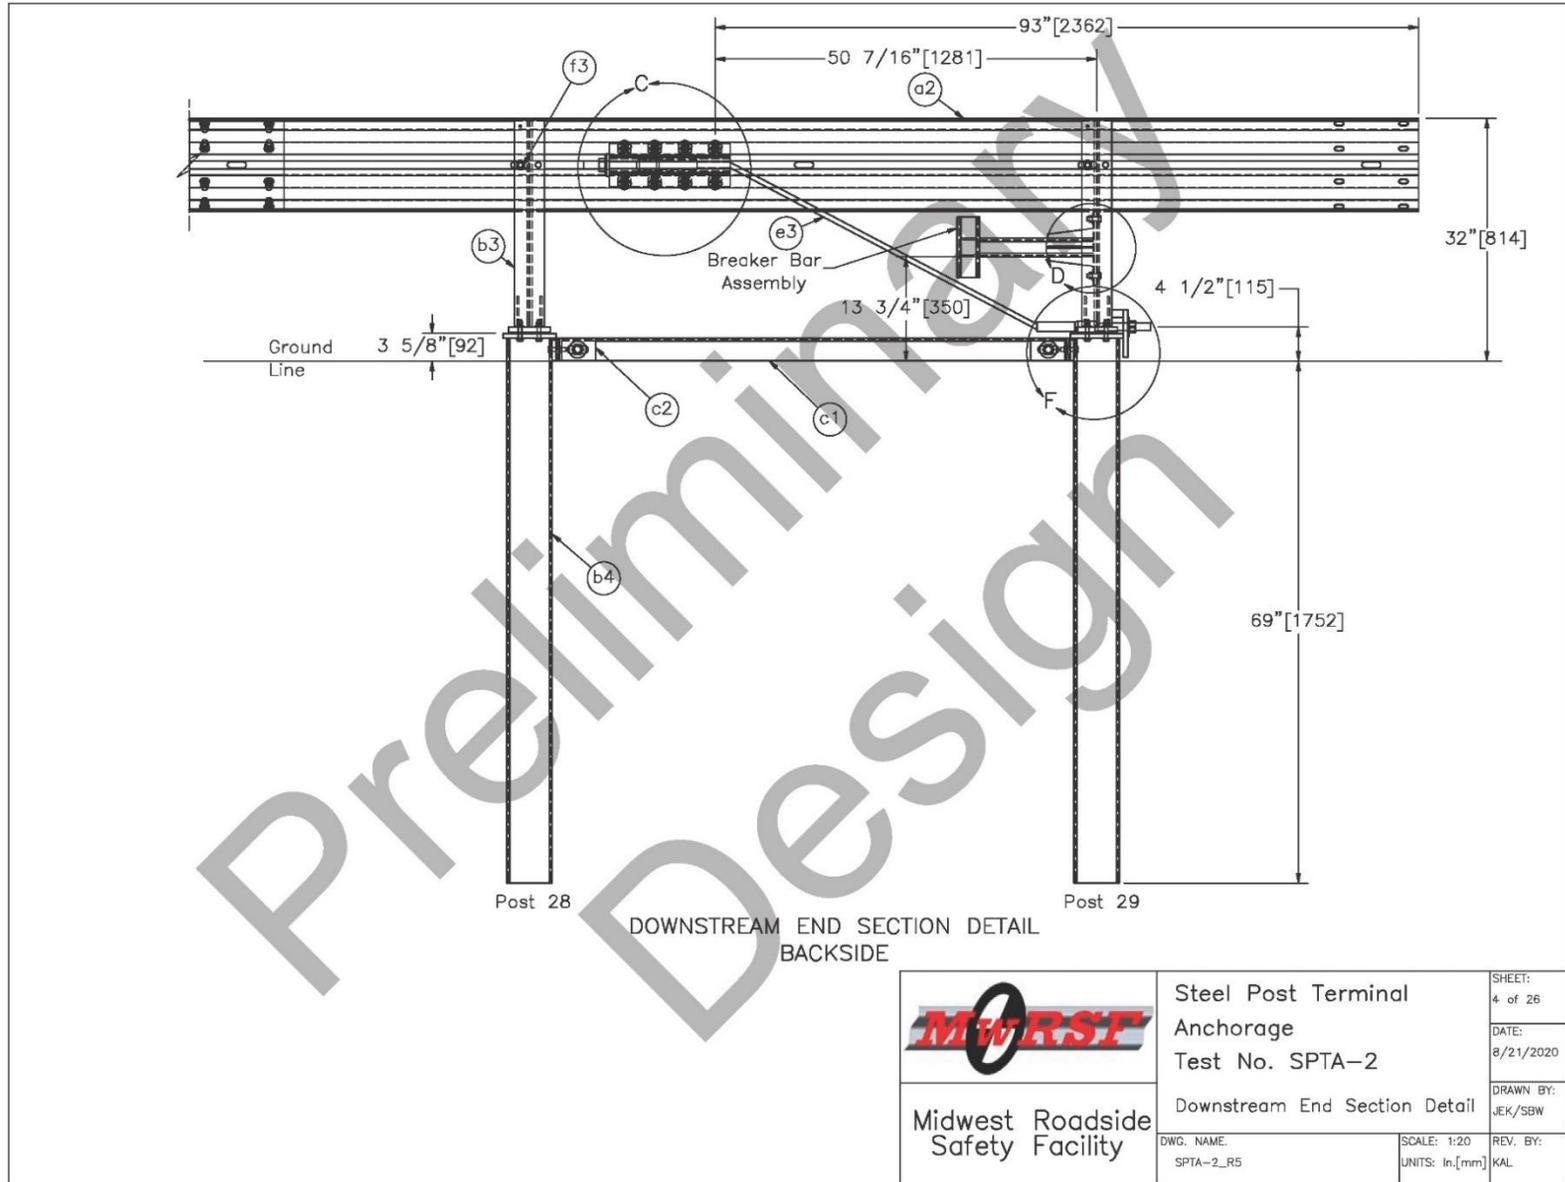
Downstream End Section Detail, Test No. SPTA-2
